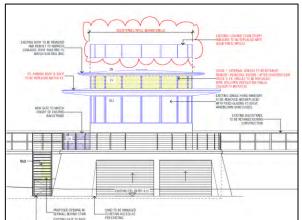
Approved promenade level plan of Lifeguard Tower, Tunnel 2 and Amenities block.
